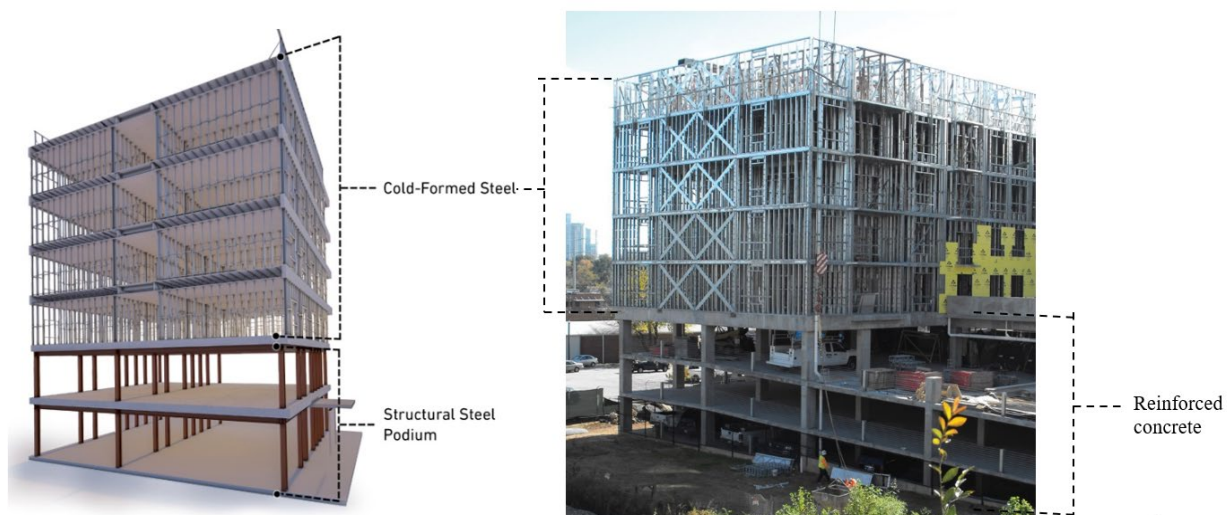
Construction of CFS buildings in conjunction with structural steel framing or reinforced concrete (image source: Google).
